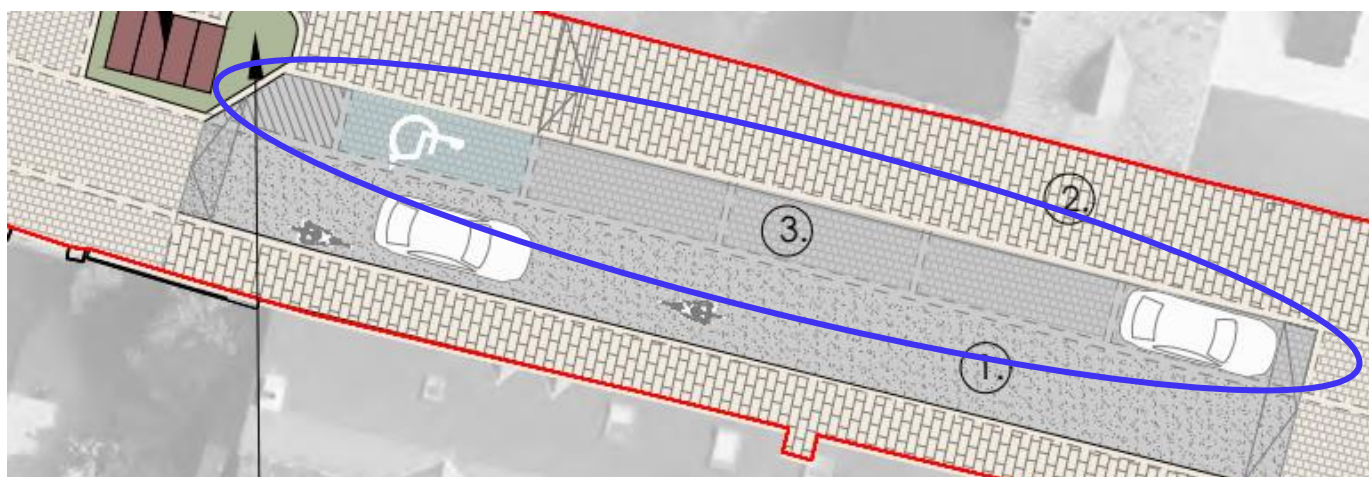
Example of Disable Parking Space being the same Width as the Standard Parking Space
